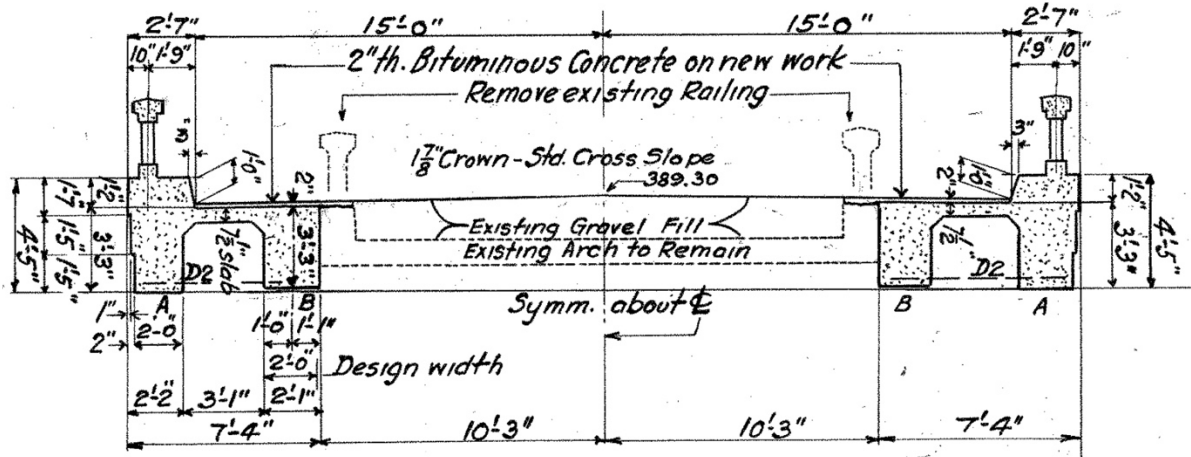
Section from the 1944 Plans. Source: Connecticut State Highway Department Plan for Construction of Widening to Existing Bridges on Routes No. 188 & 63 in the Town of Middlebury,” 7.
